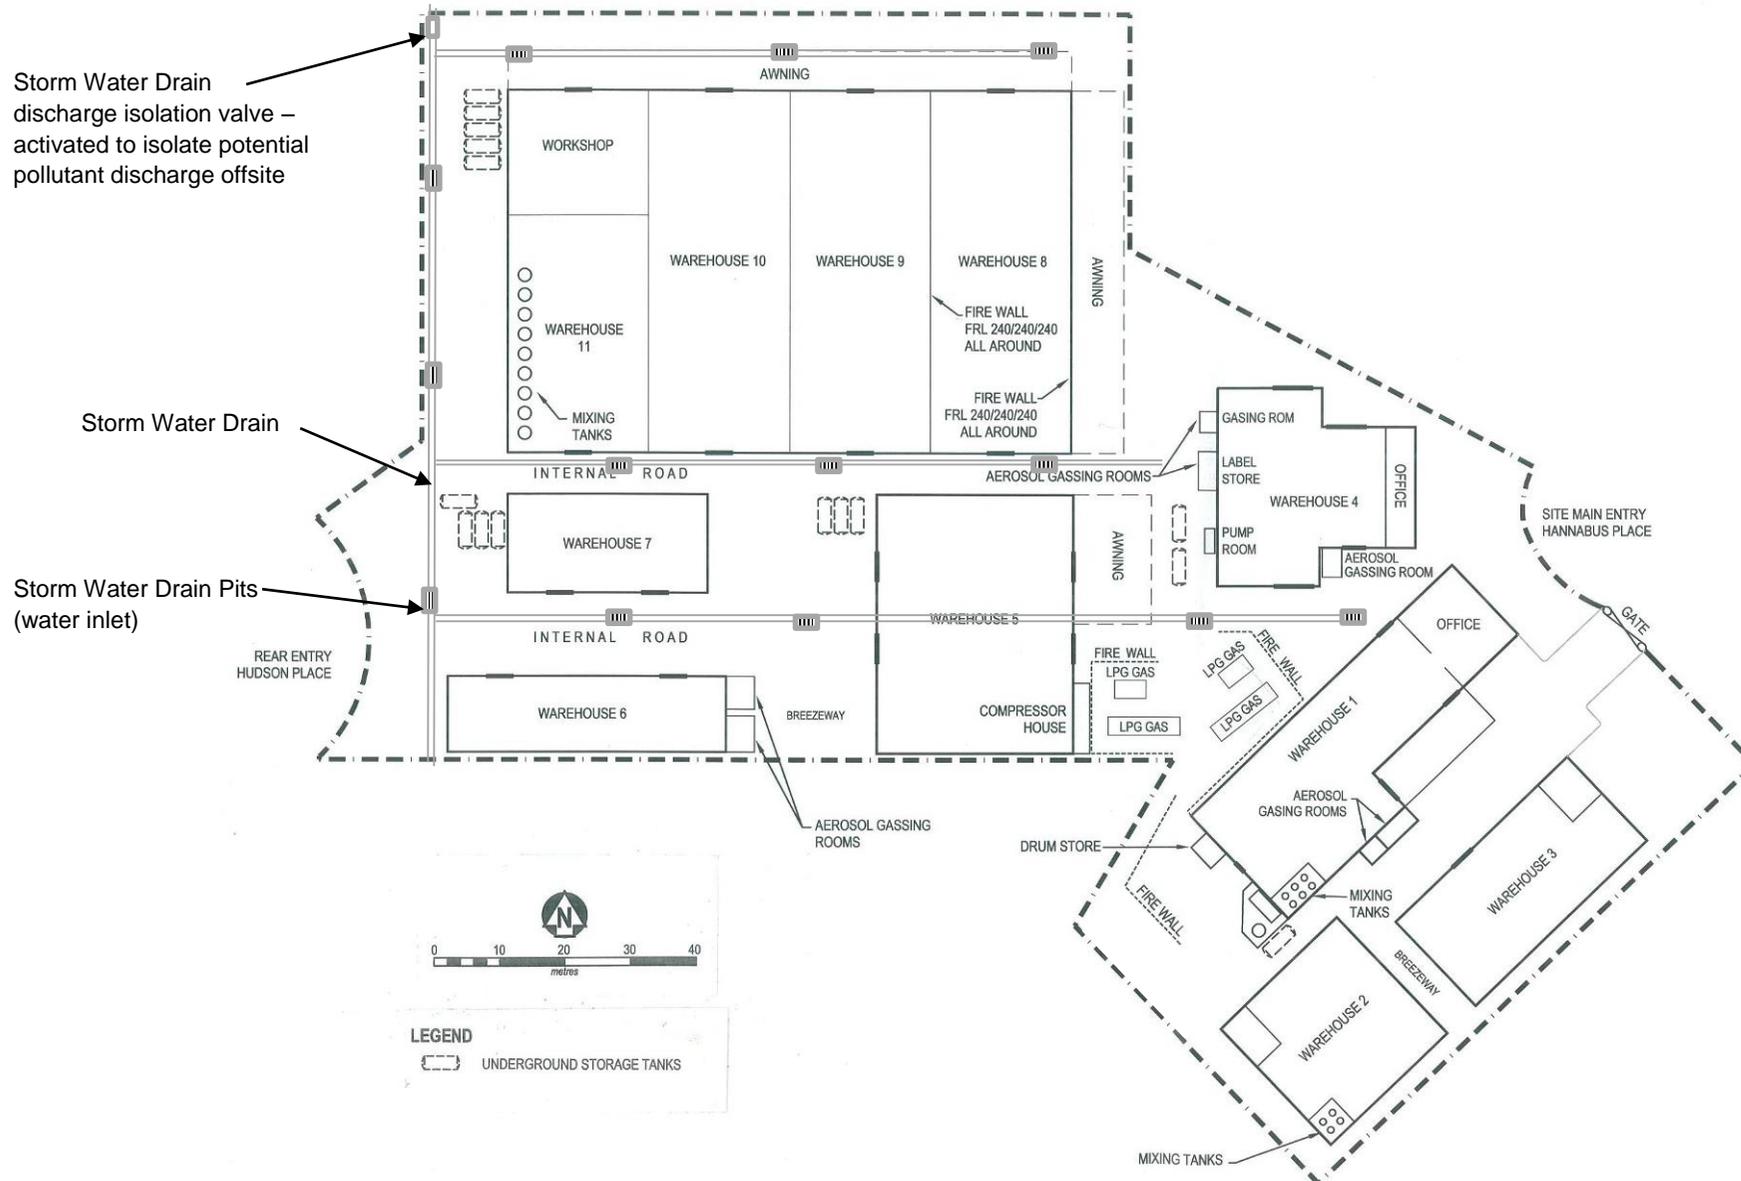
Scaled Drawing of the MMP Site Showing Building Layouts and Drainage Systems
